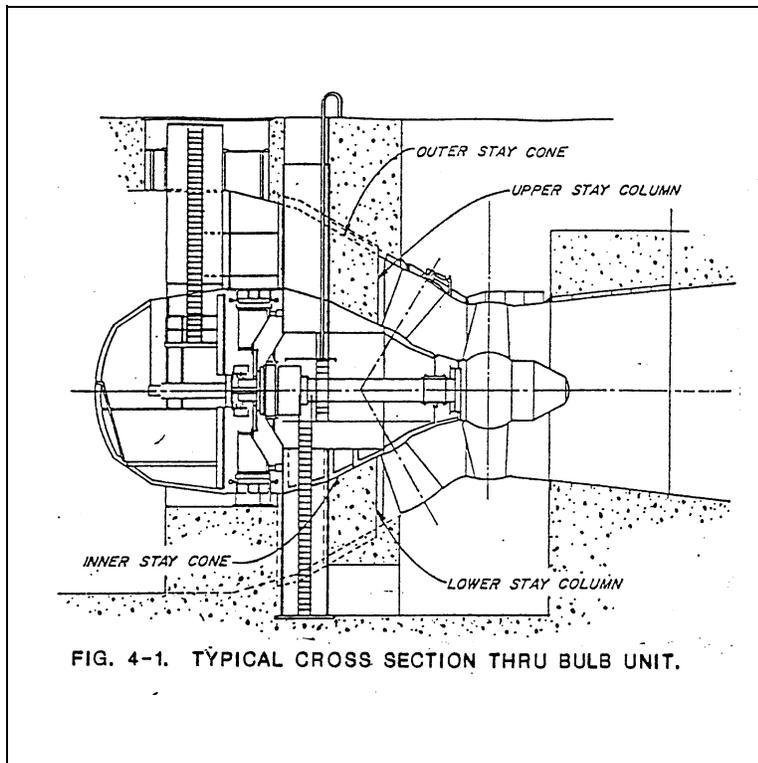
TYPICAL CROSS SECTION THRU BULB UNIT.
